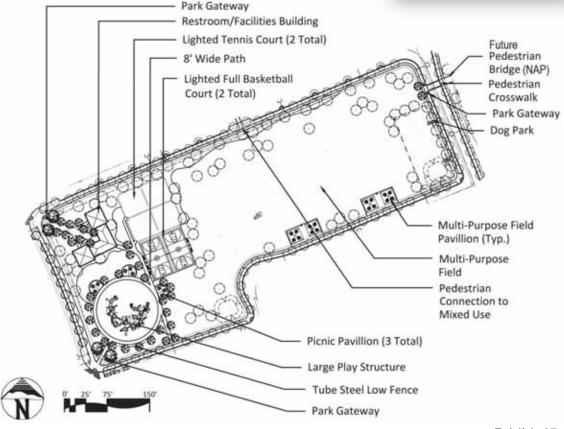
Neighborhood Park (P-1) Concept Plan
